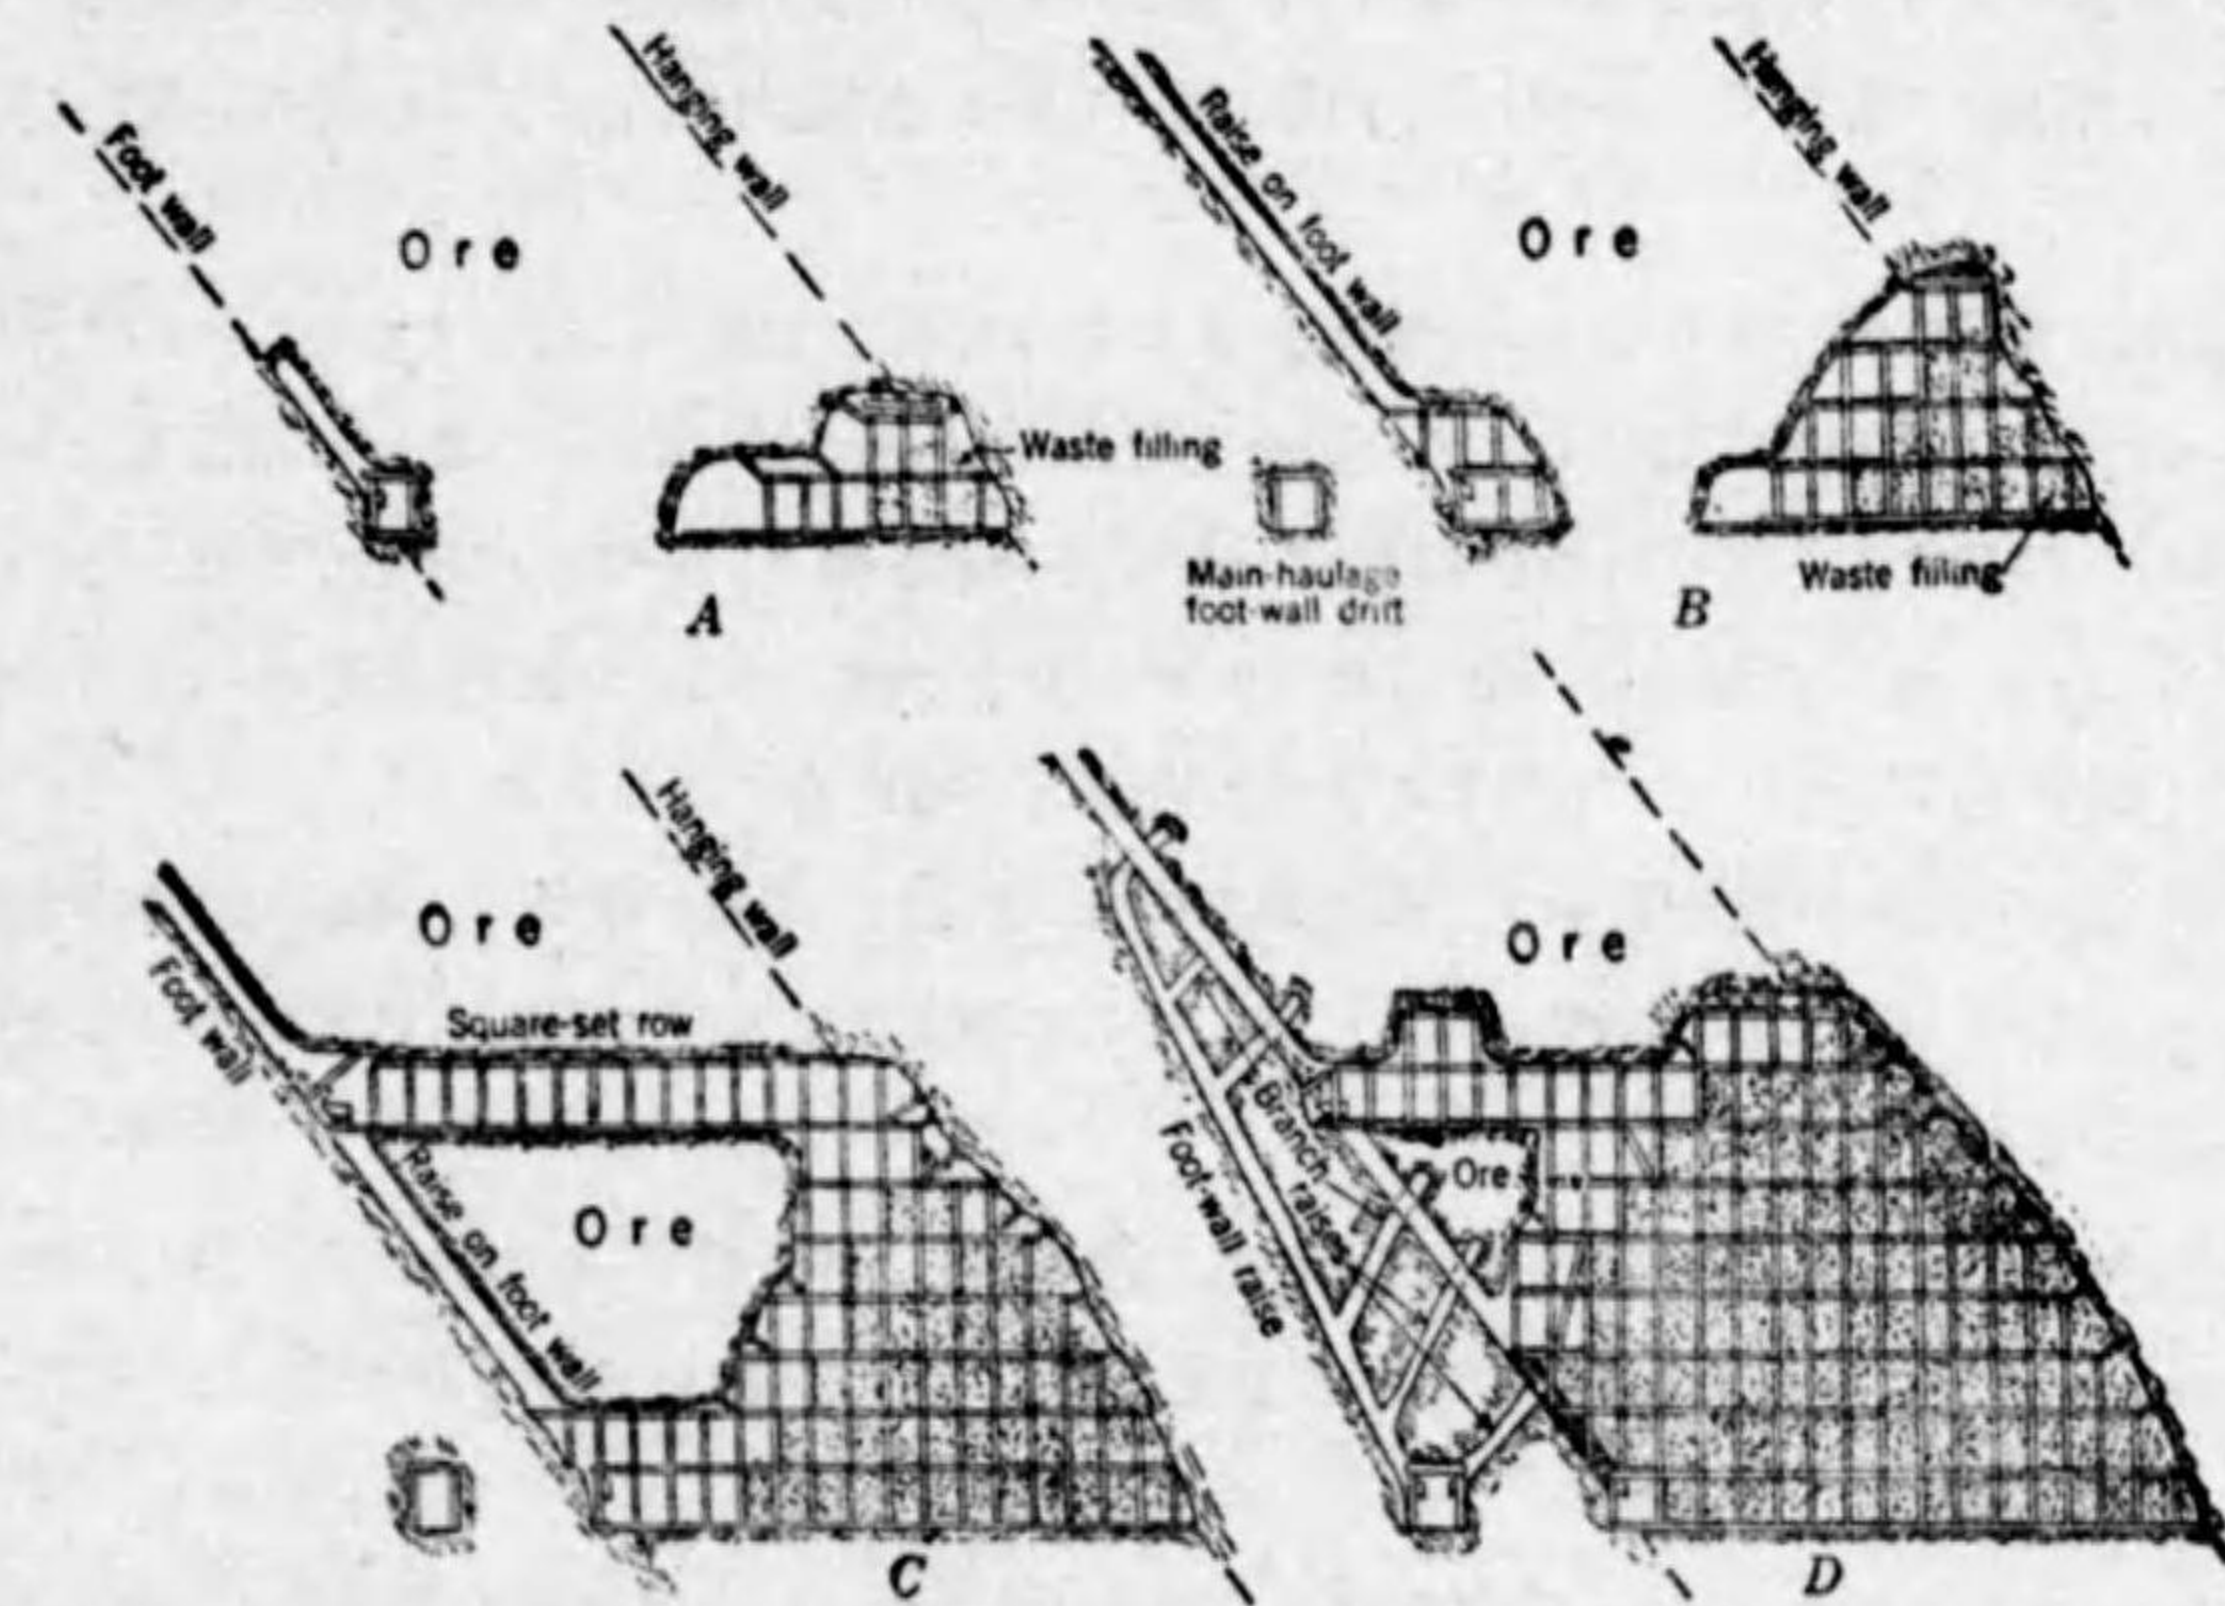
Square-set stoping system, Bunker Hill & Sullivan mine, Idaho: A, Stoping begun at hanging wall and raise started on footwall; B, Stoping advancing toward foot wall, raise on footwall completed, and main haulage drift advancing in footwall; C, Sill floor completely developed and top of stope connected to raise; D, First lift of stope nearly completed and footwall and branch raise from haulage drift completed.
